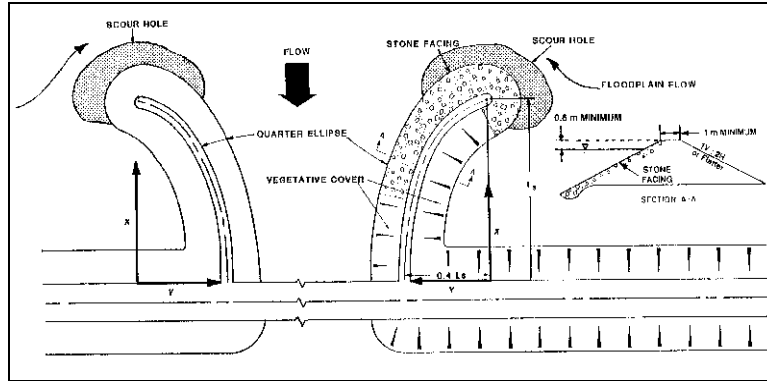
Typical guide bank (modified from Bradley).⁽¹⁾
